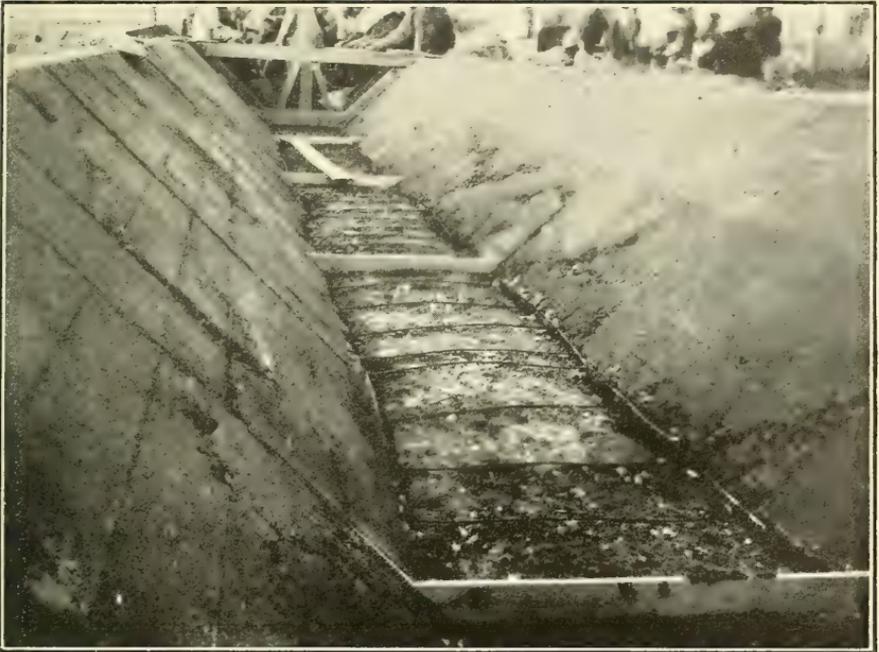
CONSTRUCTION REINFORCEMENT AND EXPANSION JOINT STRIPS USED IN CONCRETE LINING WORK, TUCSON FARMS CO., TUCSON, ARIZ.
